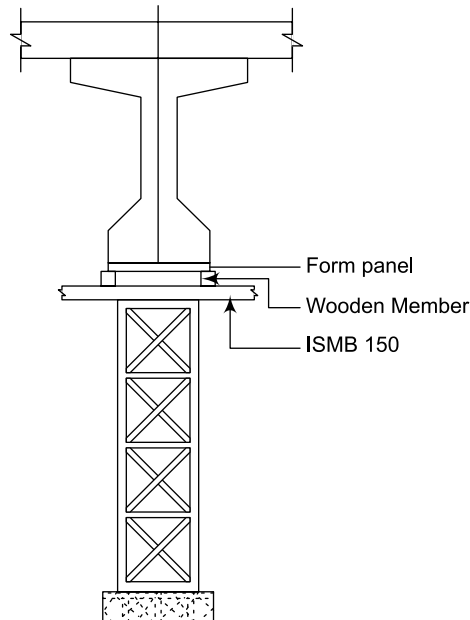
Detail of Trestle Supporting Girder and Slab Beam Formwork.
